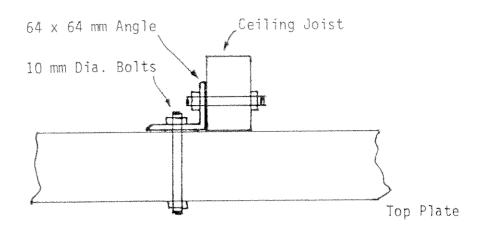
Fixing of Ceiling Joist Members to Top Plate Members.
